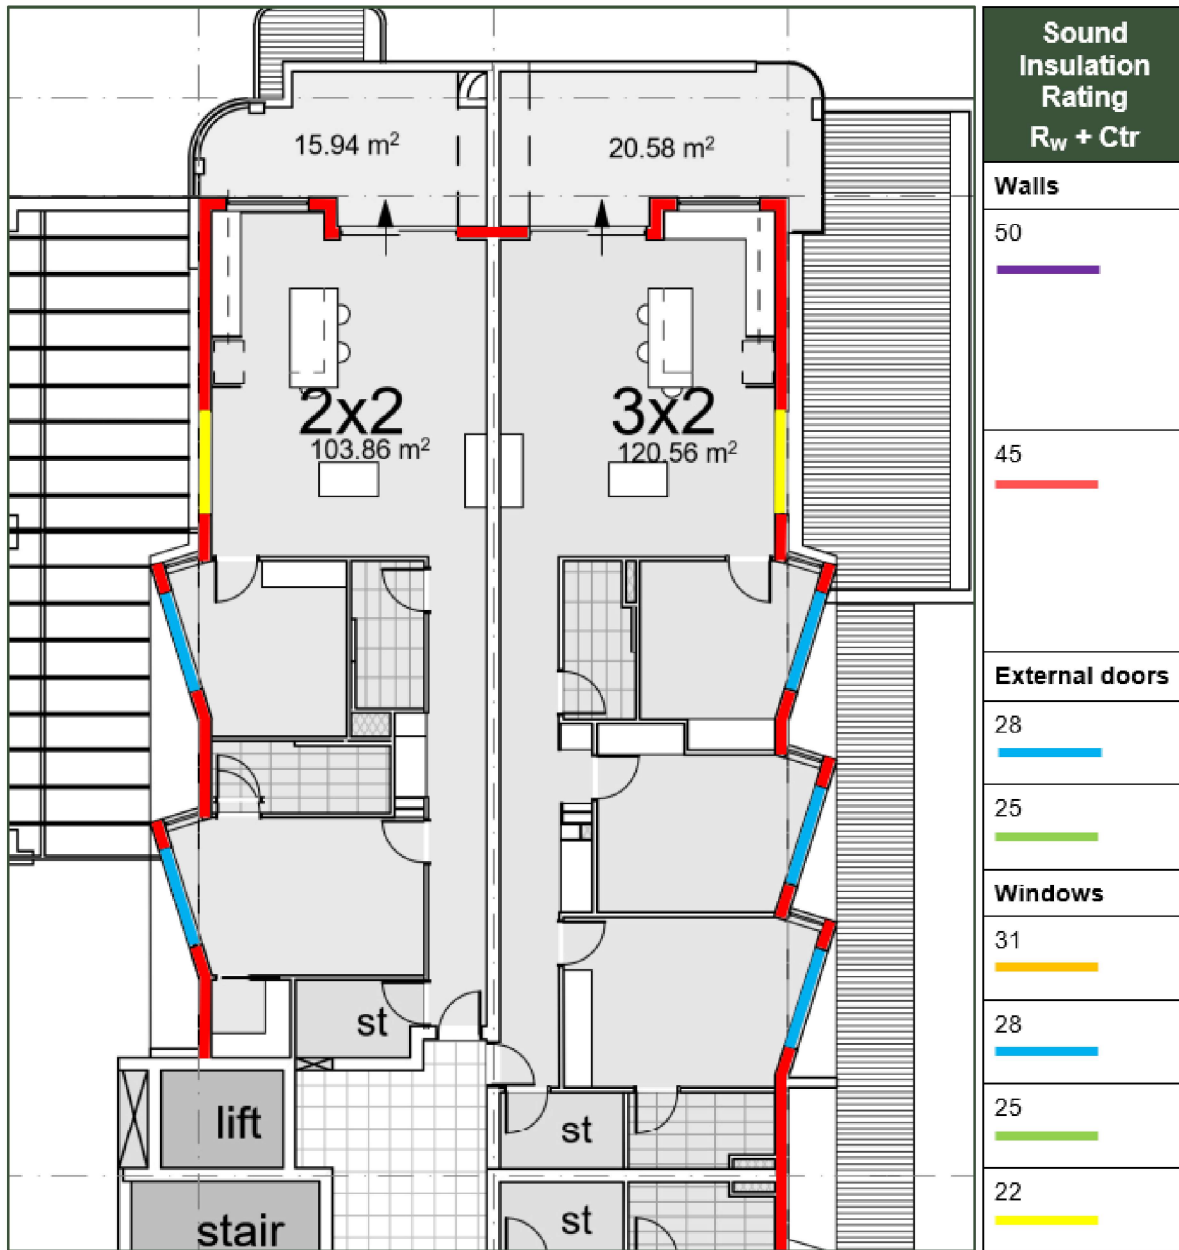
Building elements acoustic markup - Level 1 to 2, south side. Quiet House A.
